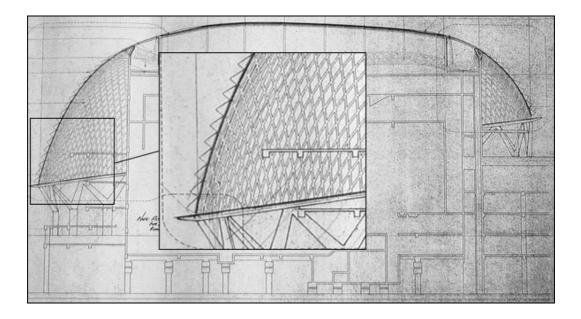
Support structure design in the non-collaborative scenario: Section of concert hall across East and West (Source: DP Architects)
